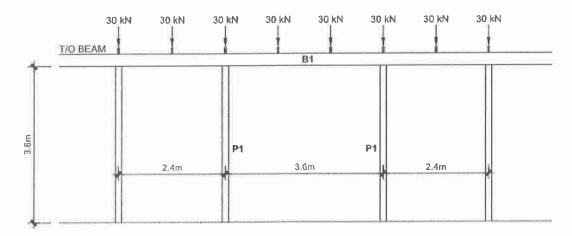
SIDE WALL BEAM / POST ELEVATIONS
